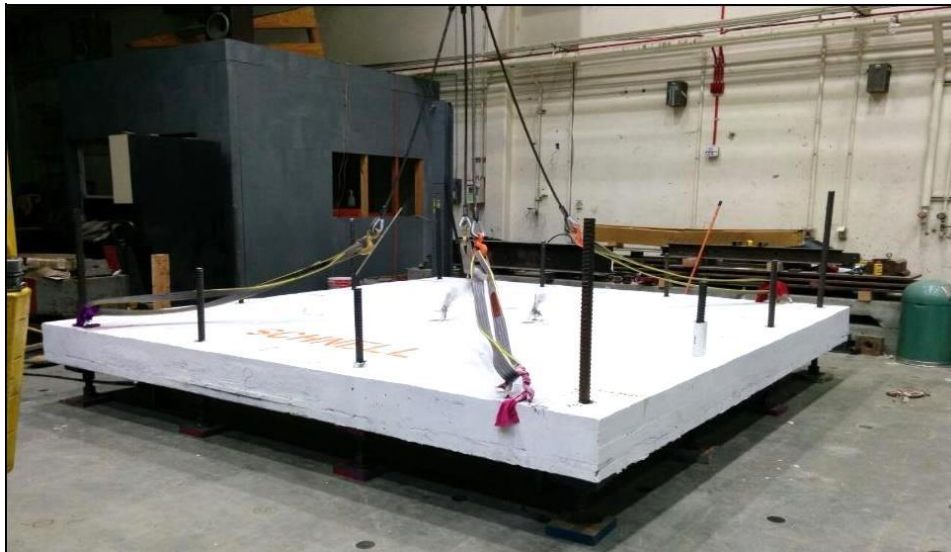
Test Setup Showing Slab Specimen Placed on Top of Steel Beams
